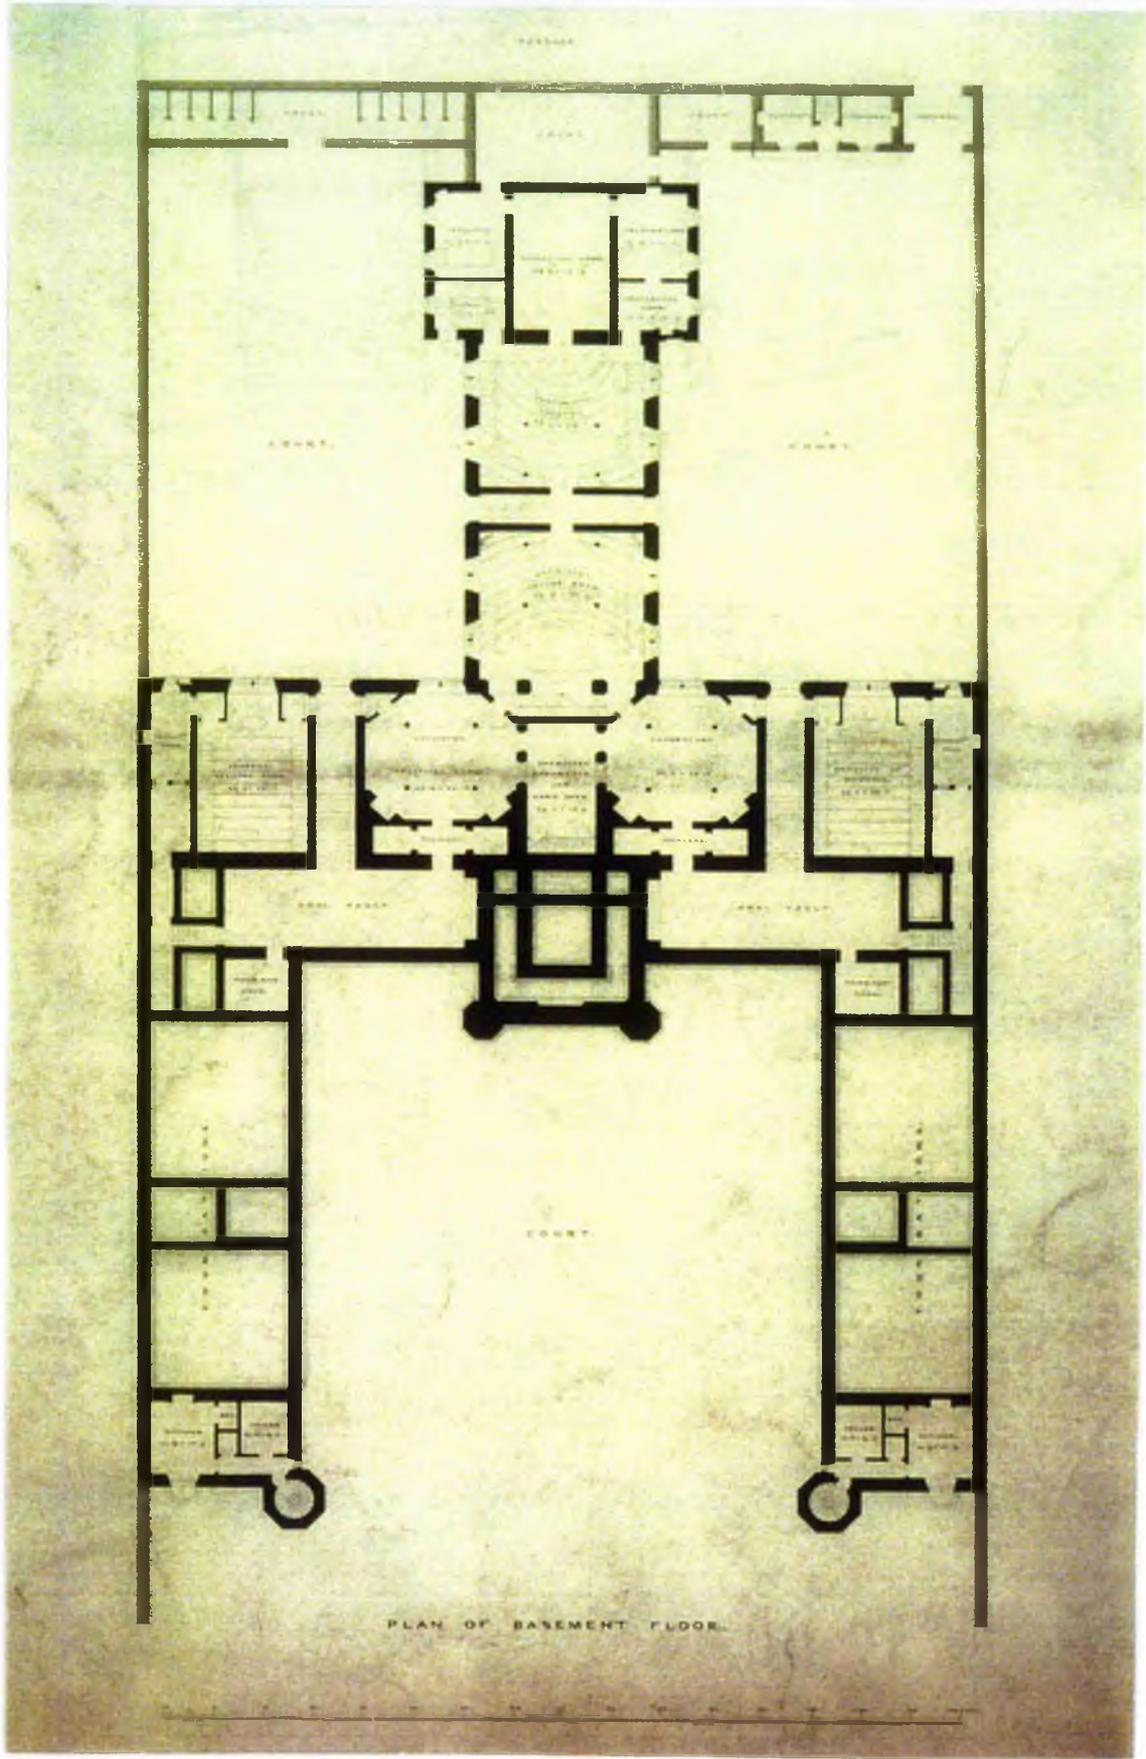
Marischal College. Lower ground floor plan. A. Simpson, June, 1836.
